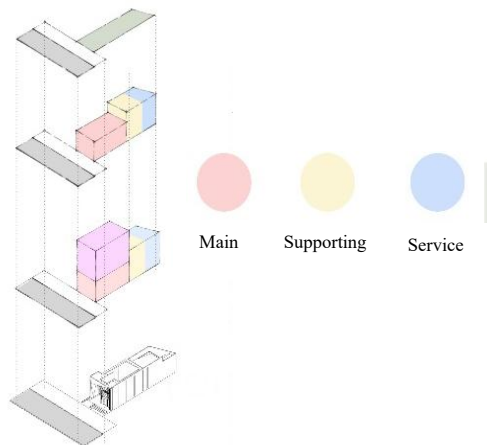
Application of the Tri Mandala Concept to Building Zoning
